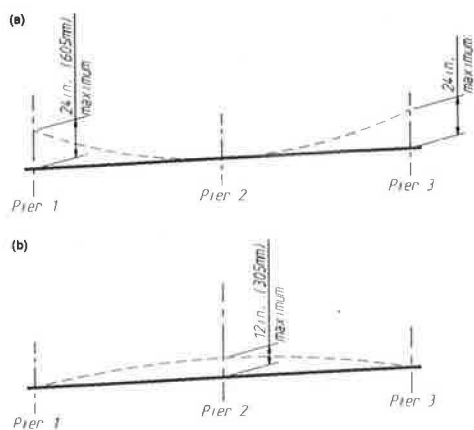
Vertical deflection limits for (a) jacking at Piers 1 and 3, and (b) jacking at Pier 2.
